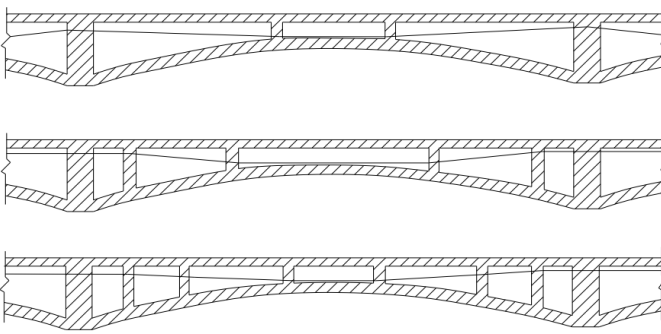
Schematic diagram of outer beam arrangement of box girder body
